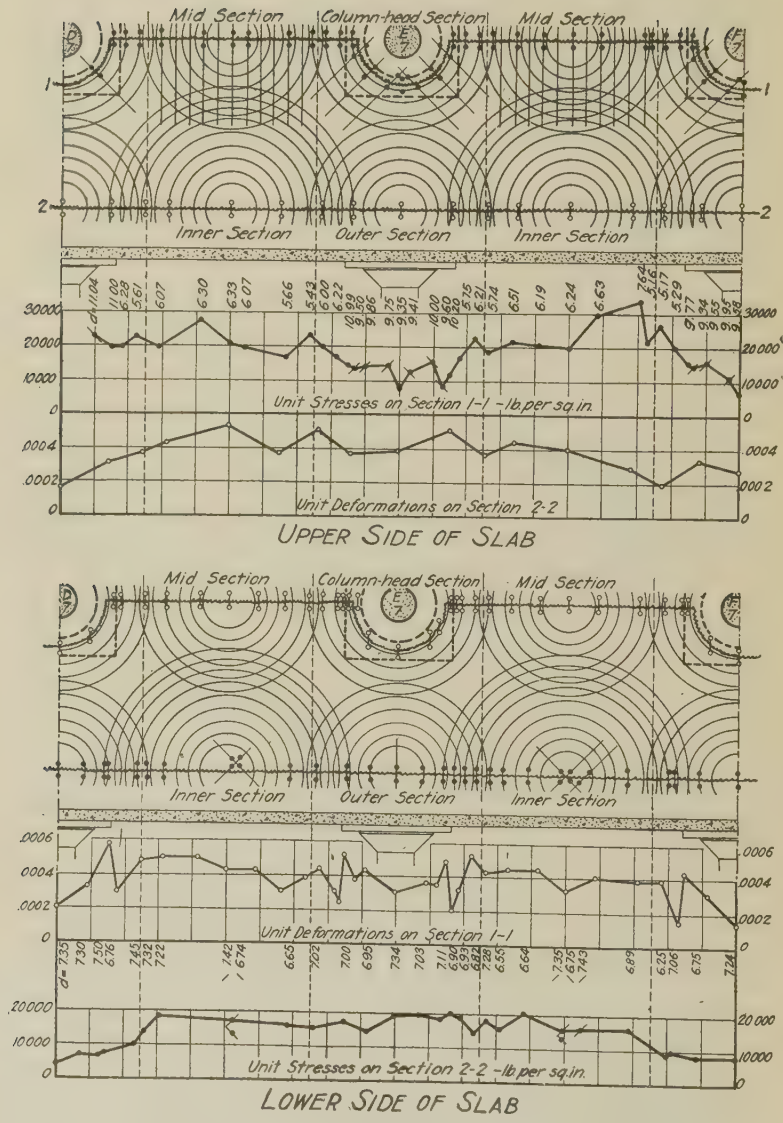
STRESSES AND DEFORMATIONS ON JOINT COMMITTEE SECTIONS.
